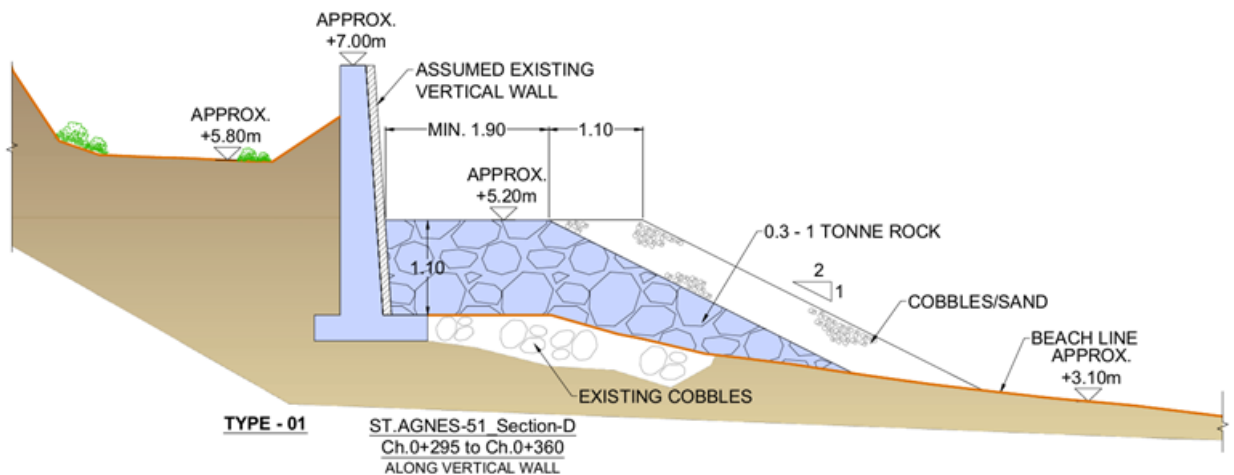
Typical cross-section along the west side of the vertical wall (Chainage 360m to 295m)
